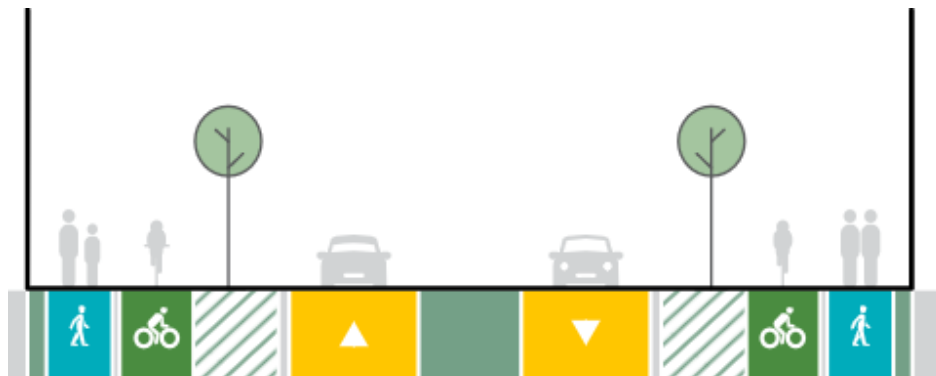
CFAF Outcome – Spedding Road East Indicative 24m cross section
